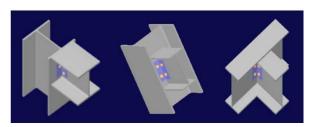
Dmodel of Beam-Column-Flange, Beam-Column Web & Beam-Girder Connections.
